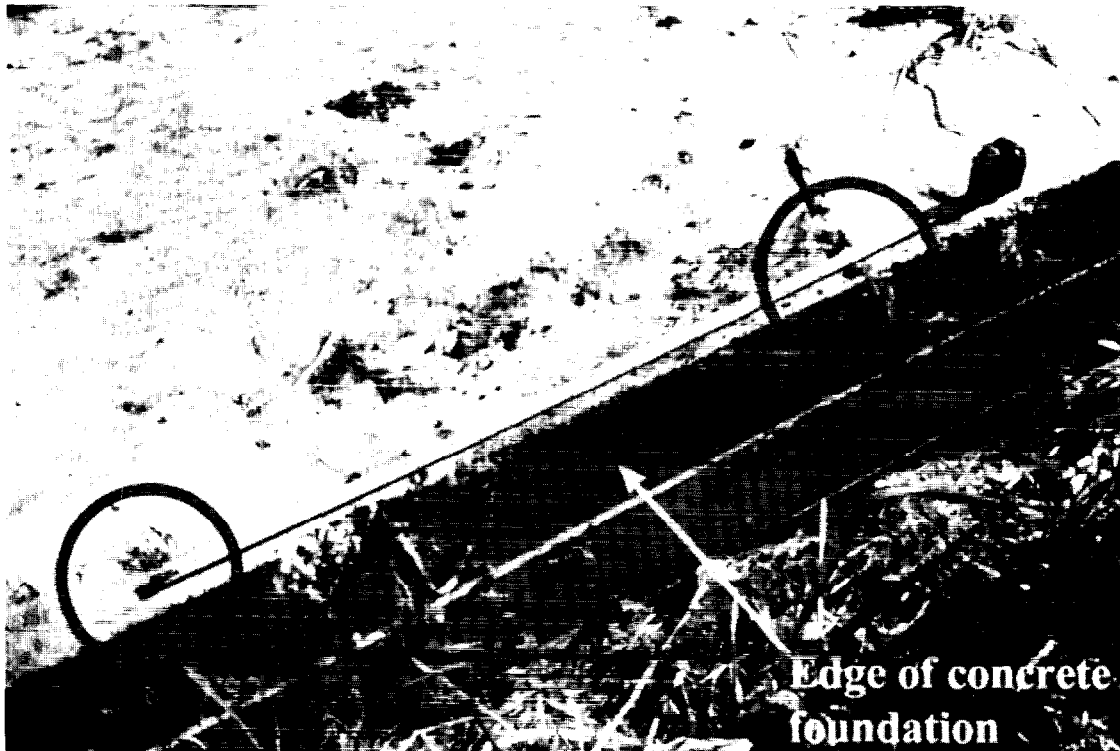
Evidence of pullout of nails used to fasten sill plates to concrete foundation.
